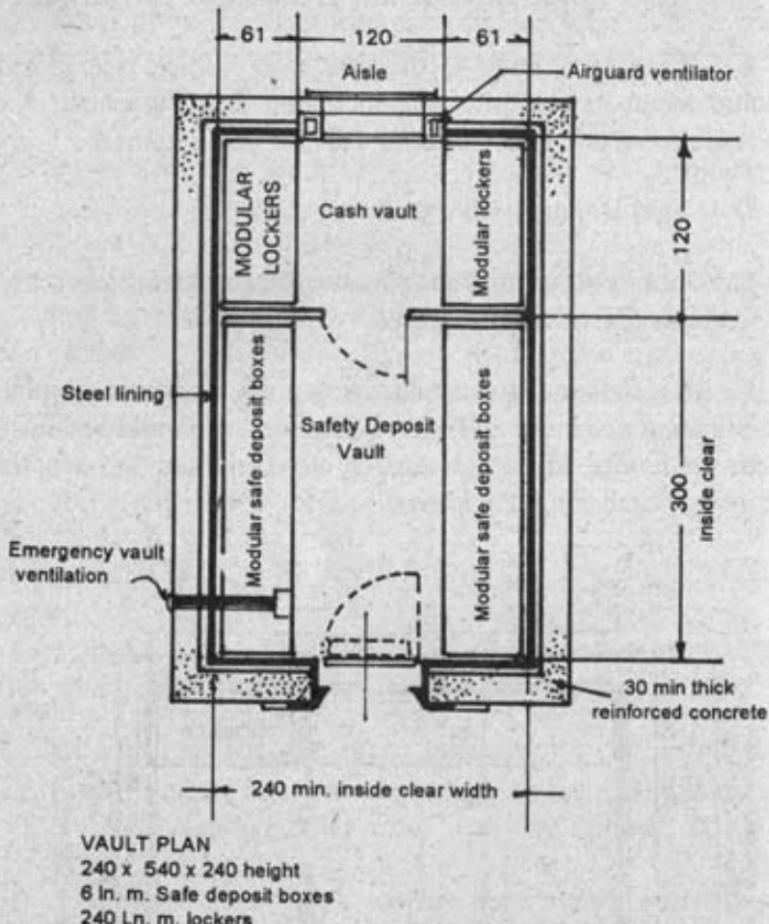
PLAN OF A SINGLE AISLE VAULT
